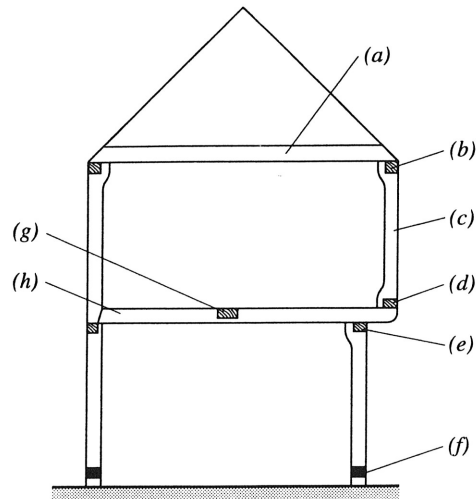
Box frame. (a) Tie beam, (b) wall plate, (c) wall post, (d) bressummer, (e) storey plate, (f) sole plate or sill, (g) summer, (h) girder.
